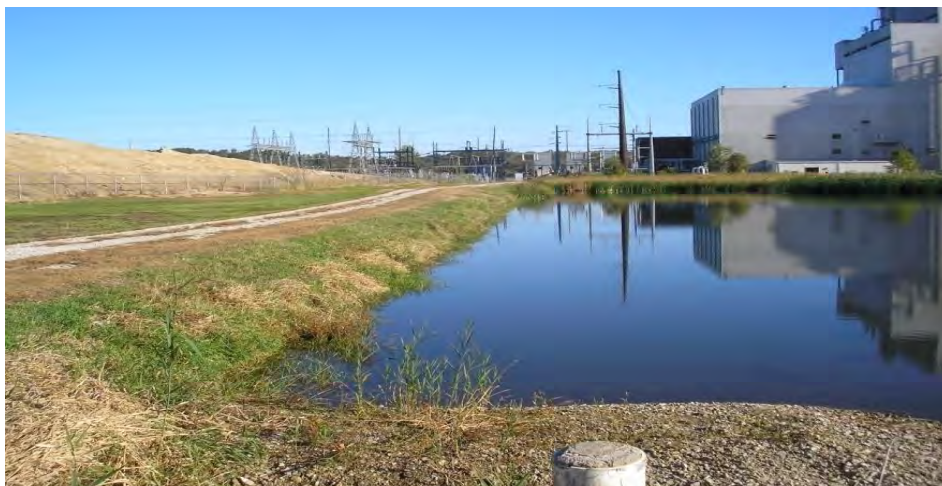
C-Stone Storage Pile over Outside Slope Ash Seal Pond West Dike
